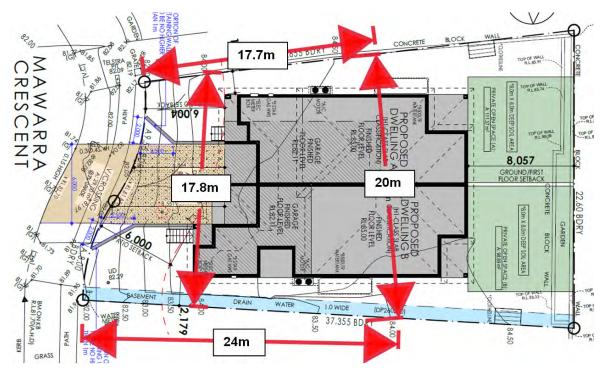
Site plan with annotated site widths demonstrating width at building line.
